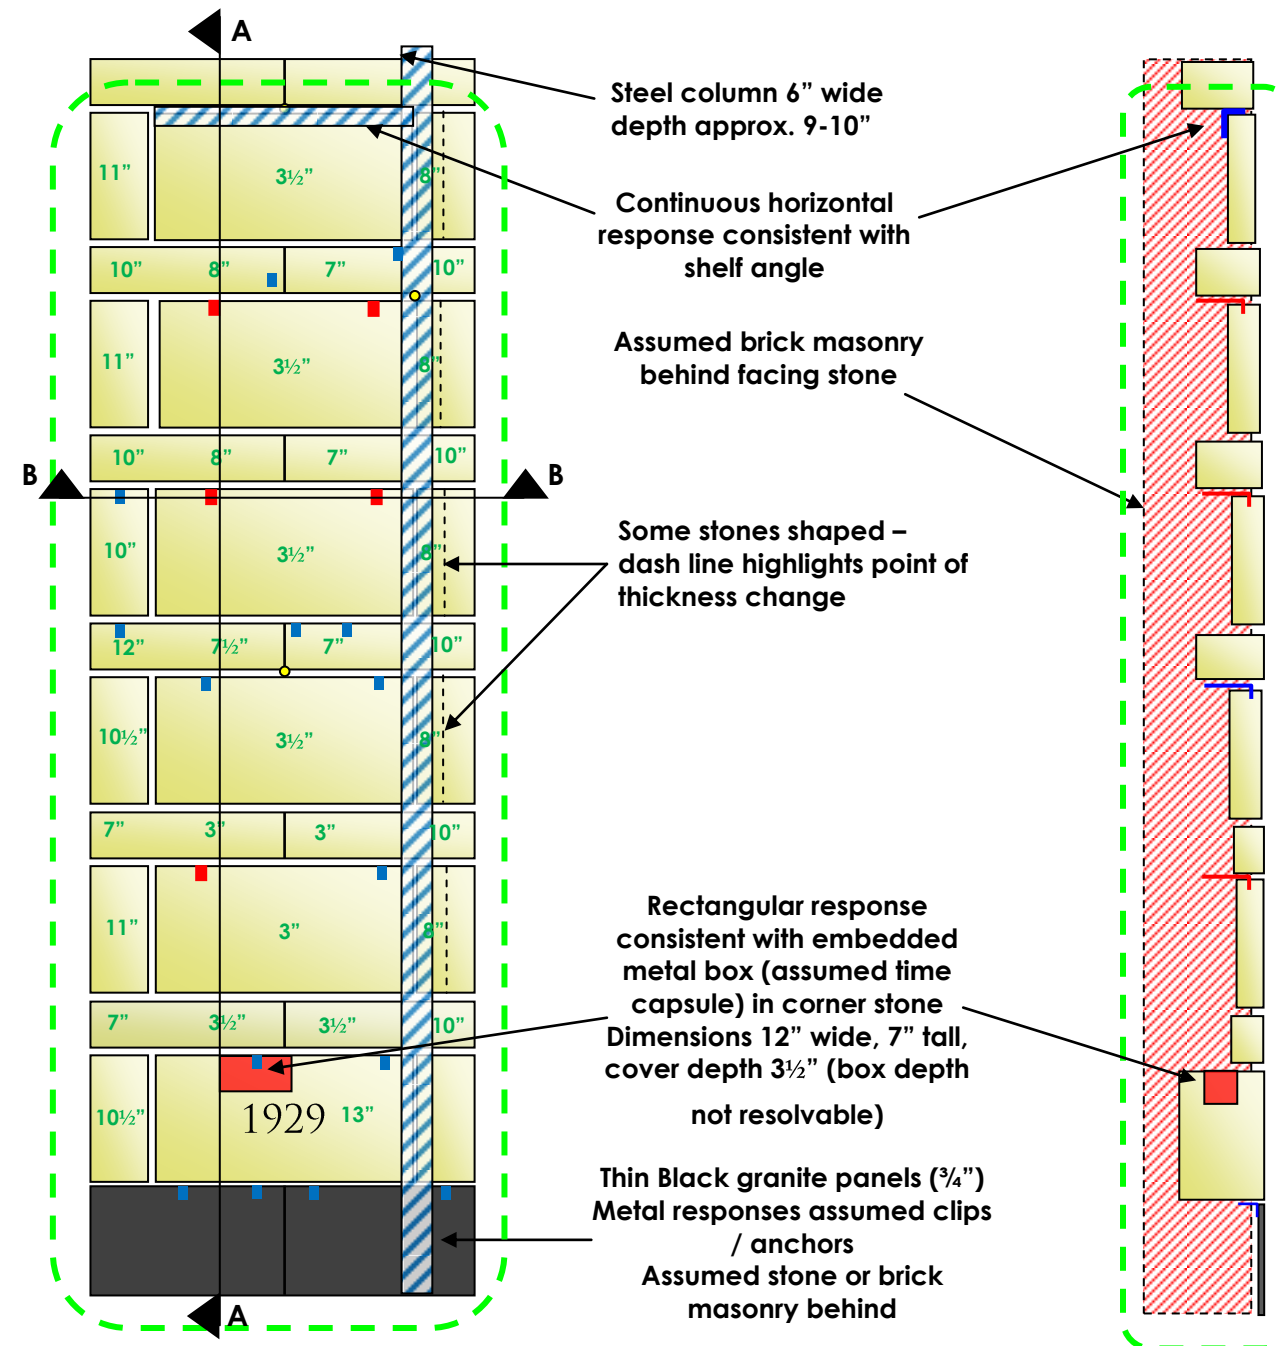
C: SCHEMATIC ELEVATION SHOWING METALLIC INCLUSIONS (ASSUMED ANCHORS, COLUMN AND ANGLE) AND STONE THICKNESSES
